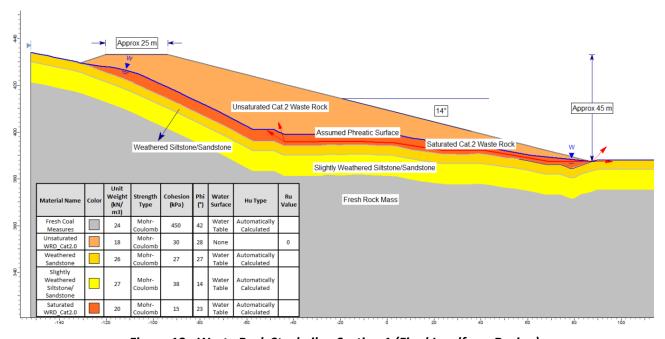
Waste Rock Stockpile - Section 1 (Final Landform Design)
